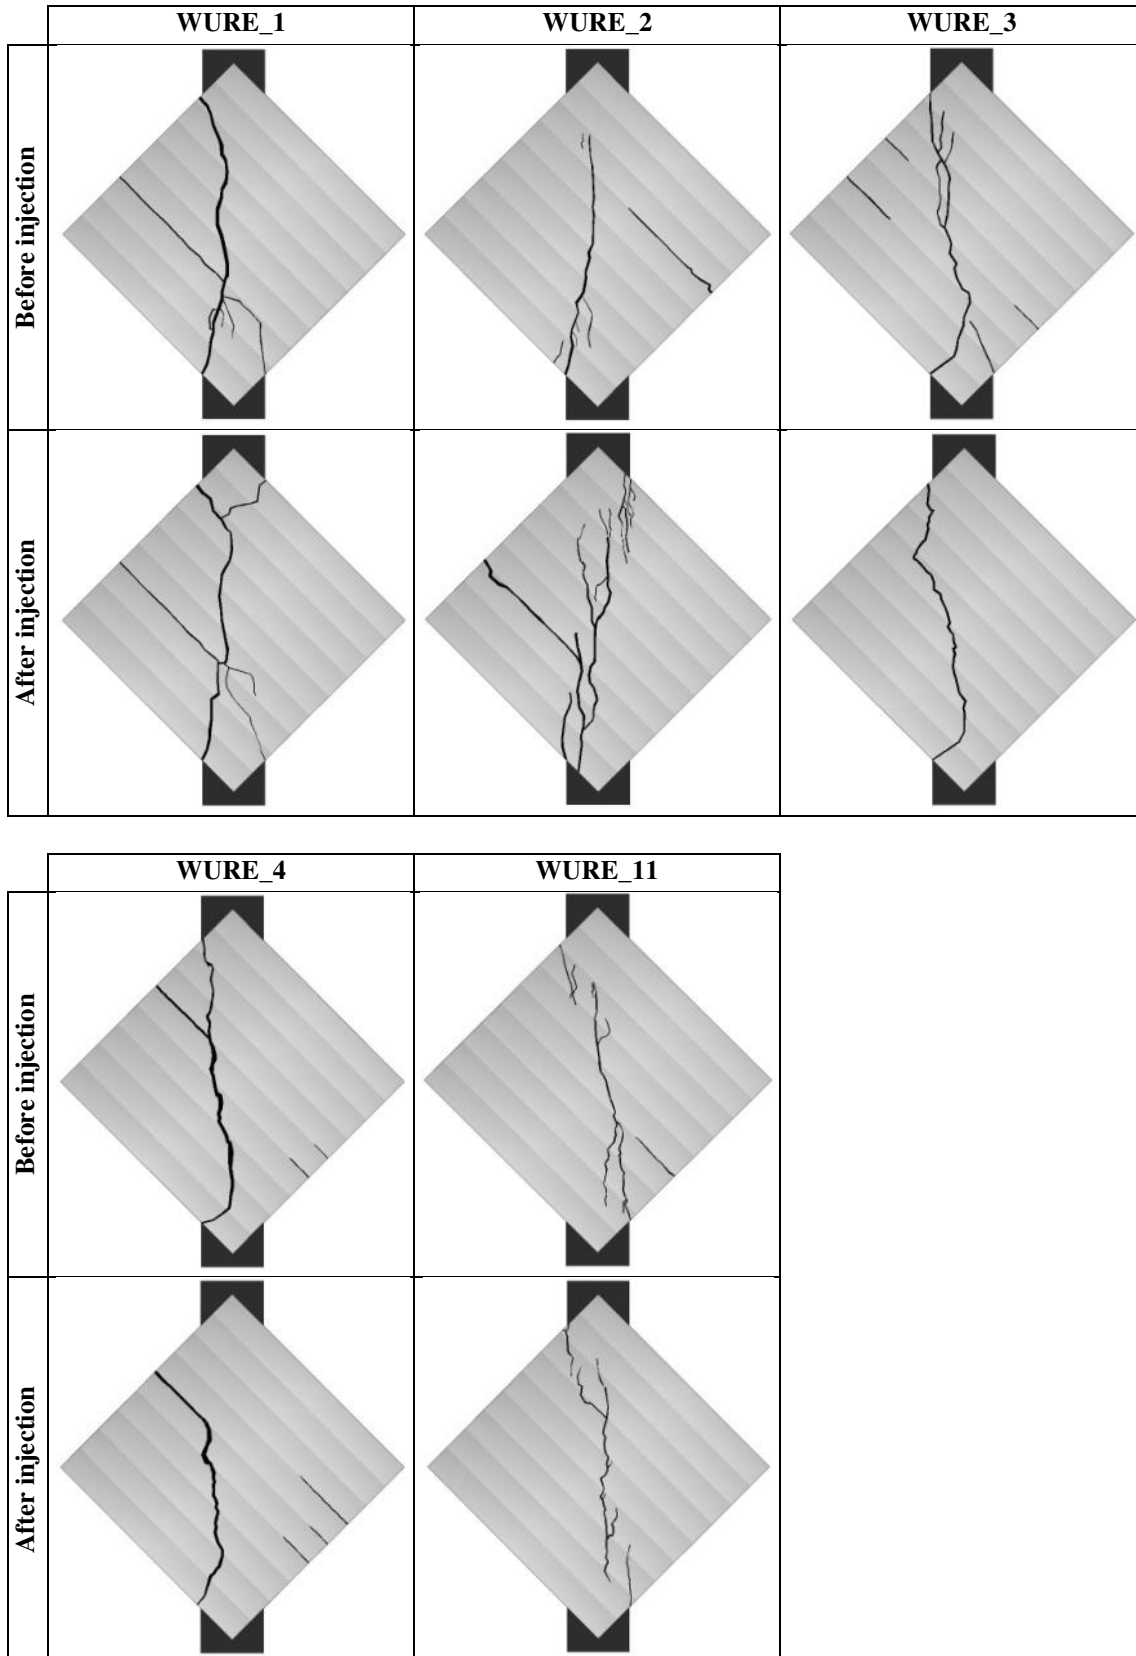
Failure crack patterns of the wallets repaired with grout II55NMG40-60, before and after injection.
